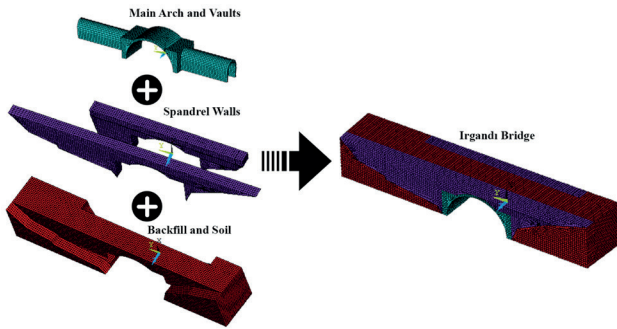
Main arch, vaults, spandrel walls and backfill of Irgandi Bridge
